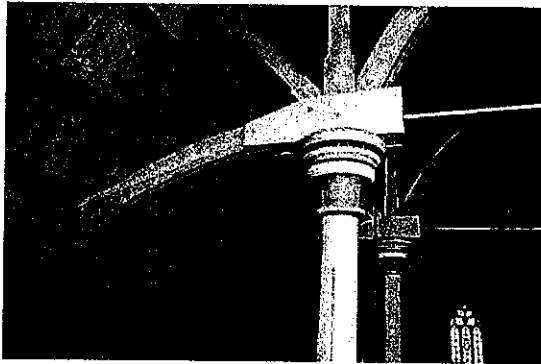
Interior, Space 2. View looking east towards chancel. Note the original timber columns.
